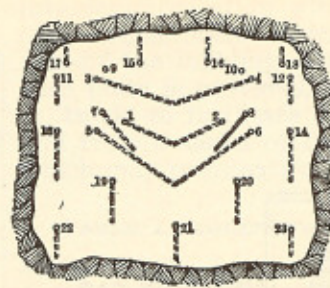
Wedge-Cut Drilled from Horizontal Bar.
